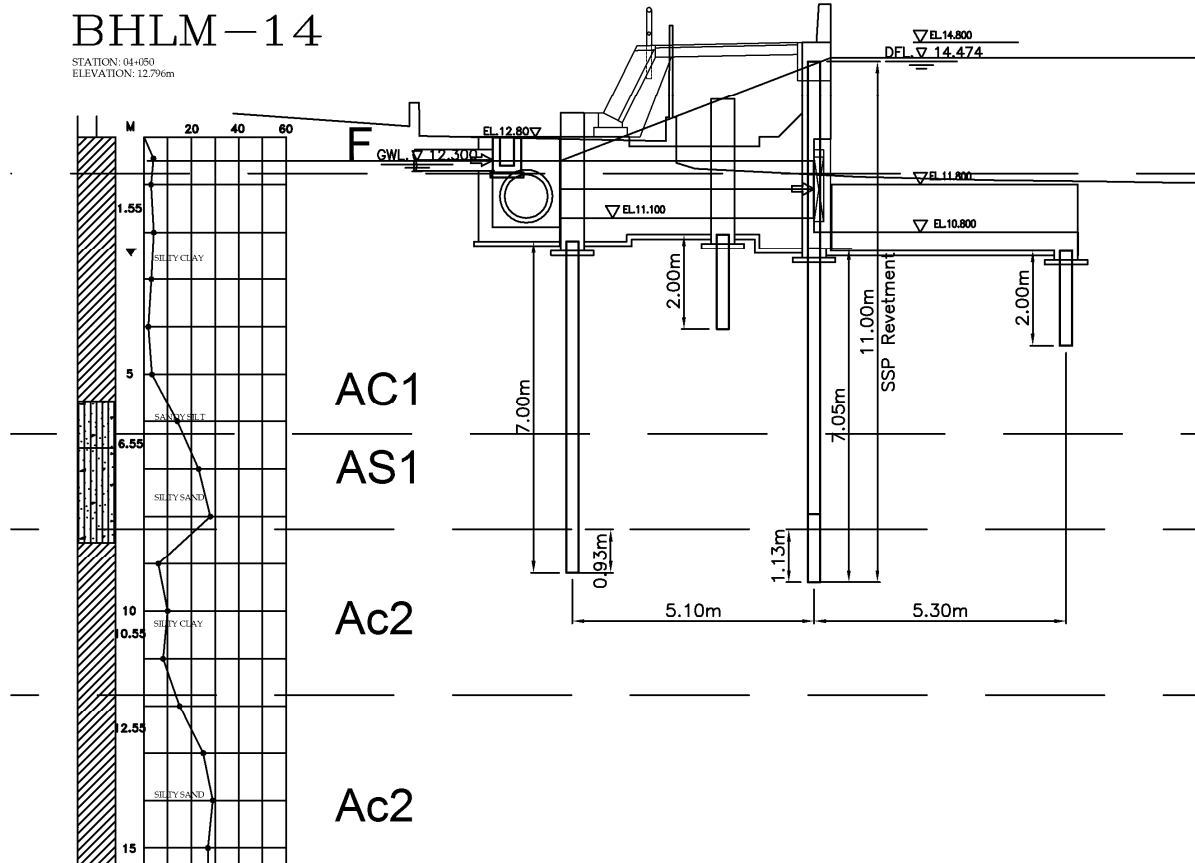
Length of SSP Cut off Wall (3/9) (MSL-3)
